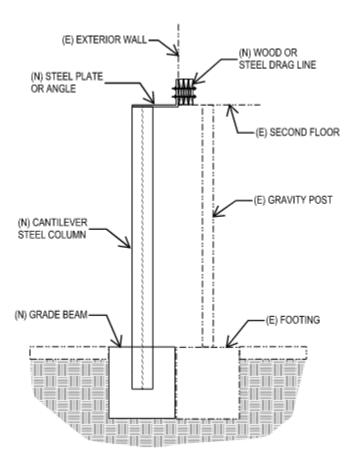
New cantilever column located outside the building footprint, introducing an eccentricity.
